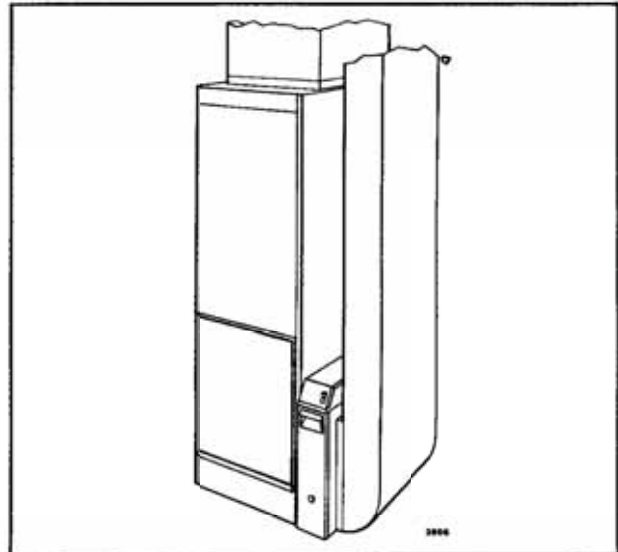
HIGHBOY FURNACE. SIDE INSTALLATION. AIR CLEANER IS MOUNTED VERTICALLY WHERE RETURN ENTERS SIDE INLET OF FURNACE.
